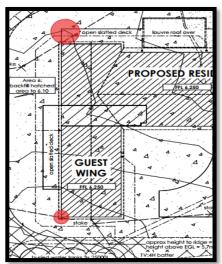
Site Plan showing location of dwelling encroachments outside of approved building envelope AC.
